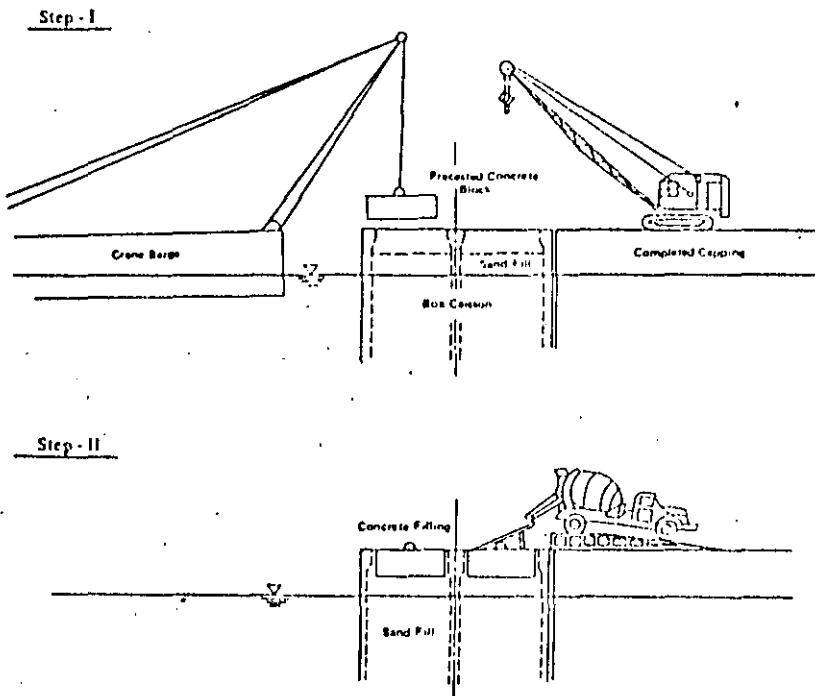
Capping of Caisson by Precast Concrete Block
